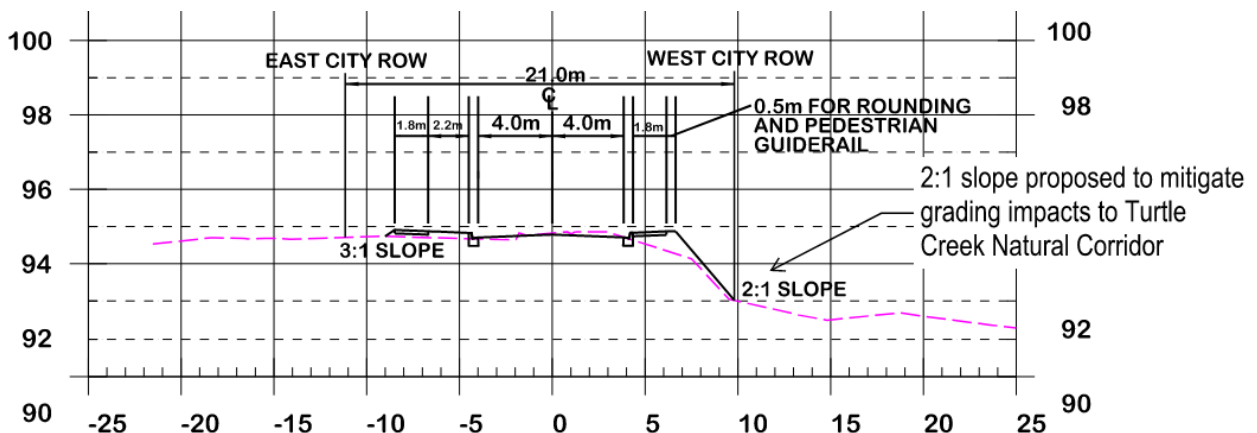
Road Section near Turtle Creek Crossing (St. 0+880)
